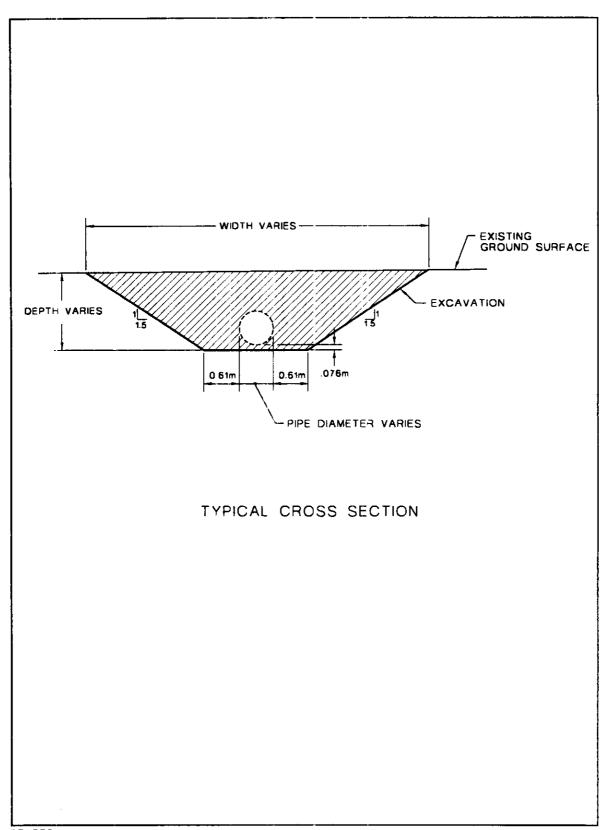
Typical Pipeline Excavation Cross Section.
